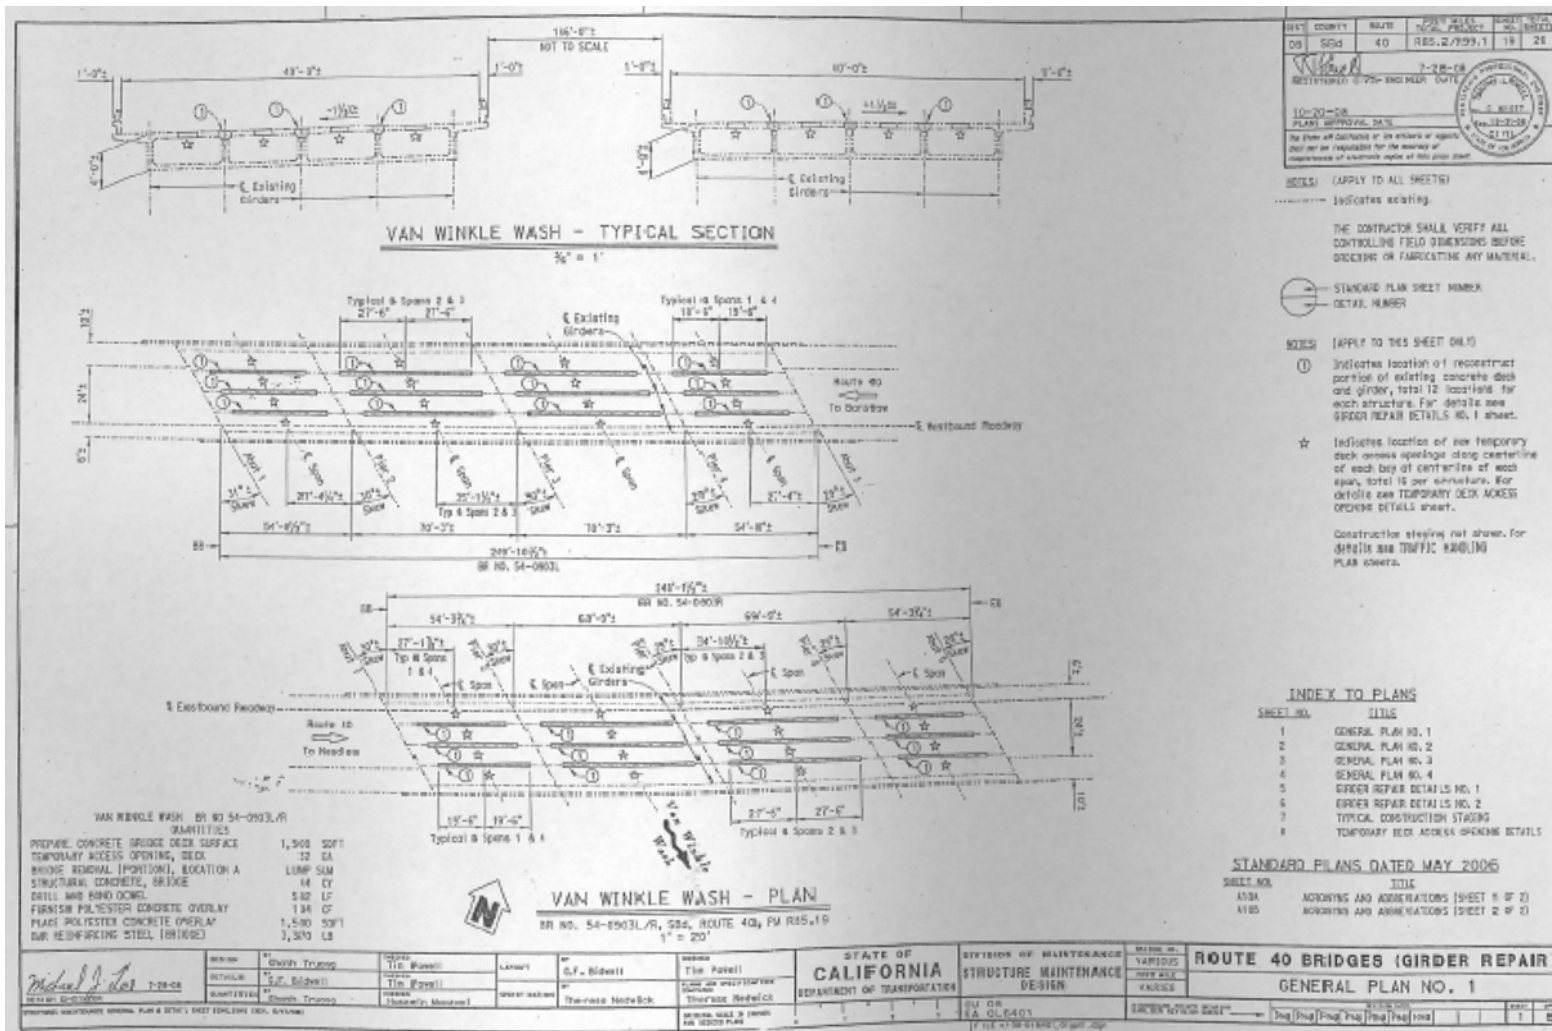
Typical section and plan for the Van Winkel Wash Bridges (Rt. and Lt.).
